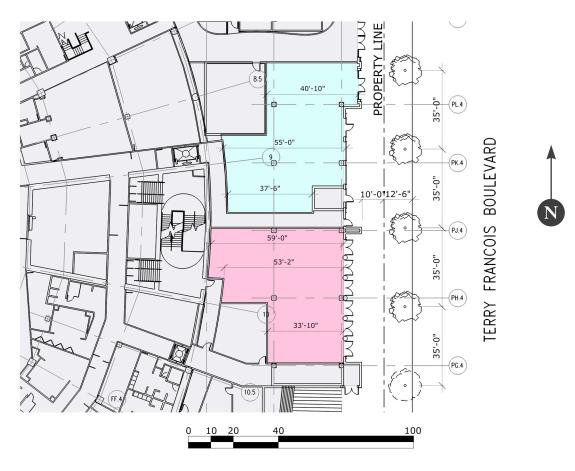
| TERRY A FRANCOIS BOULEVARD RETAIL LEVEL 050 PLAN
